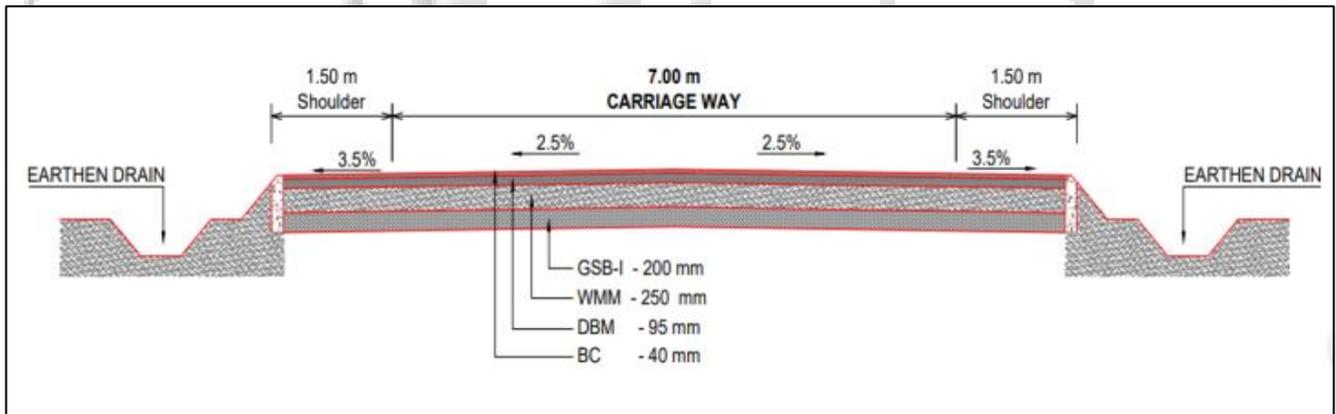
Cross-section of flexible pavement for section-1(Chainage: 01+000 to 06+000)
